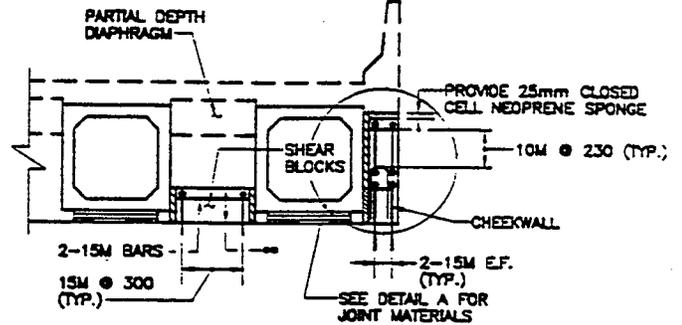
Abutment Curtain Walls Designed for Seismic Forces; (d) Typical Roadway Section for Beam Continuity
